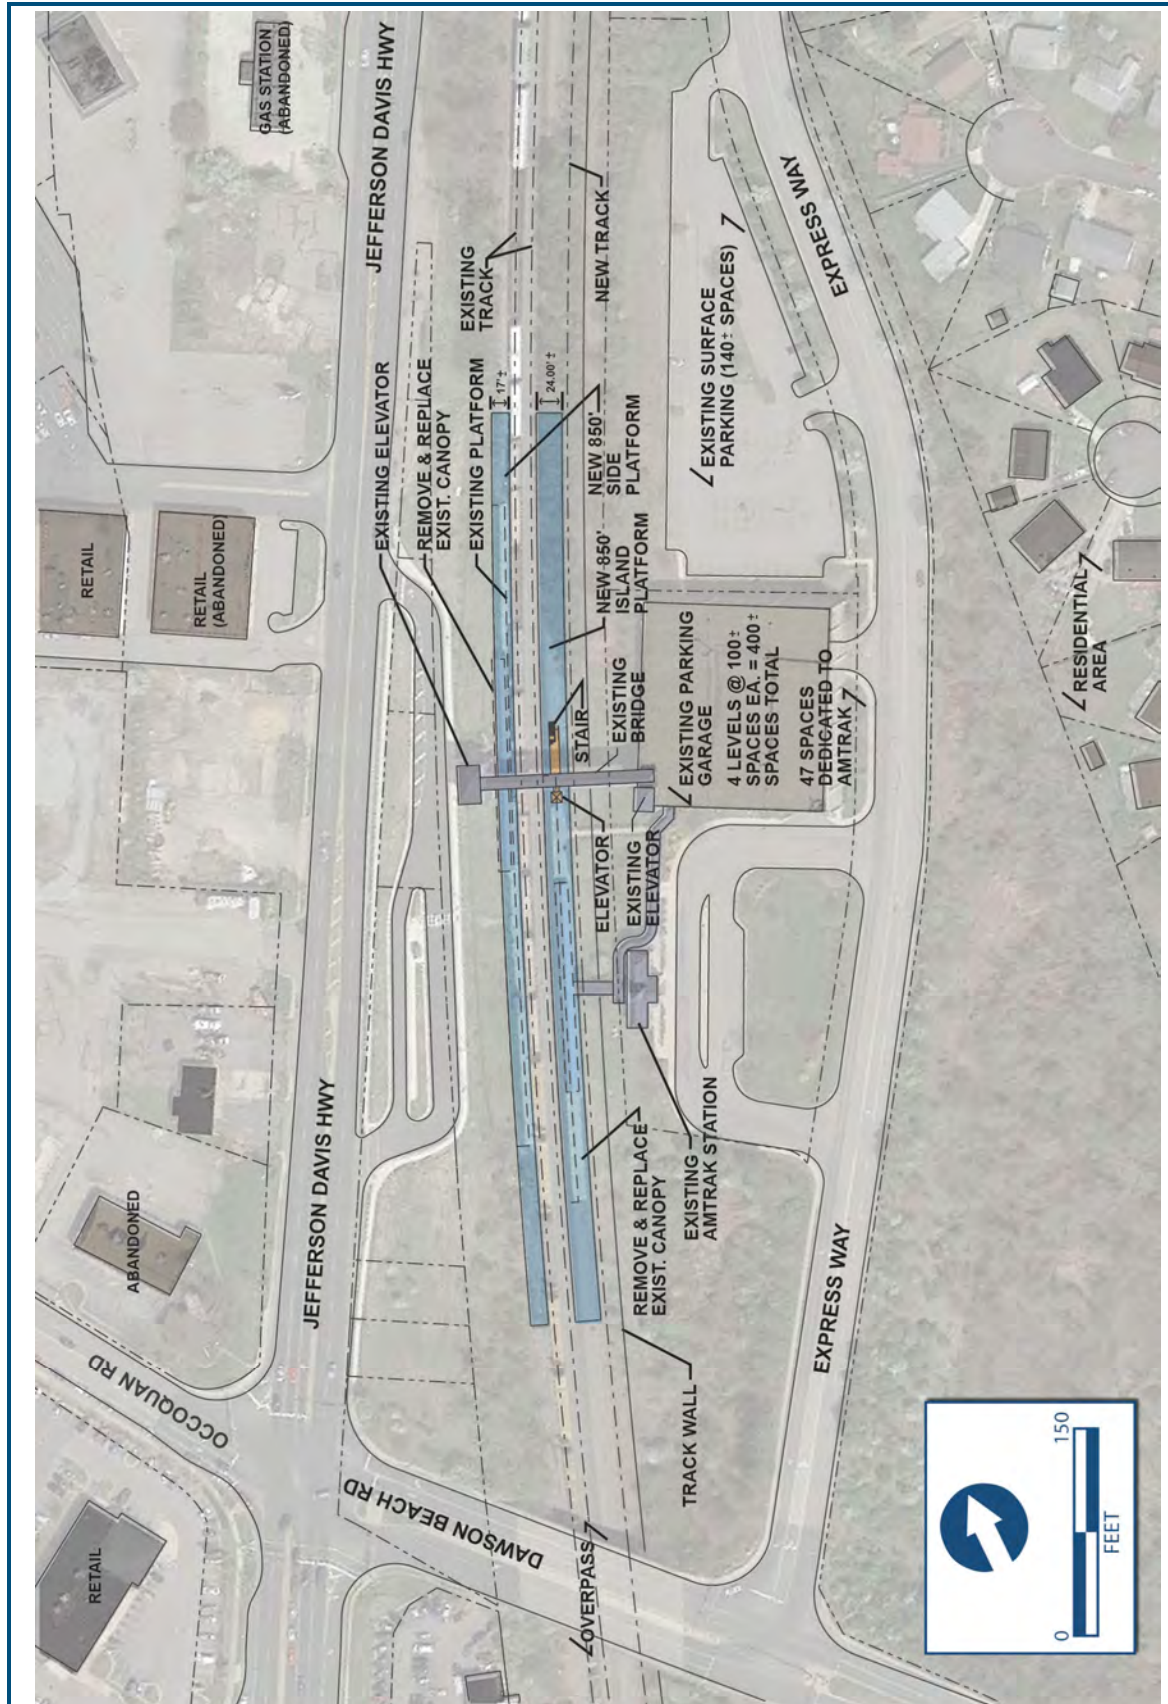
Woodbridge Station Improvements for Build Alternative 2A
